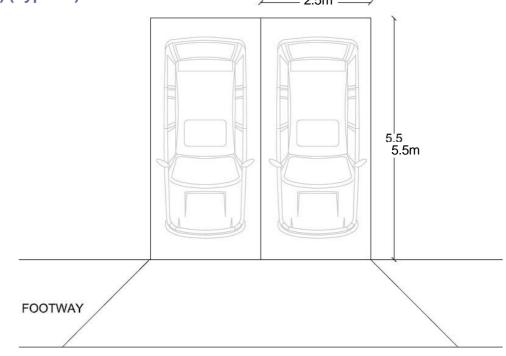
Standard parking bays at 90 degrees to carriageway edge (with footway crossing) (Type 4E)
